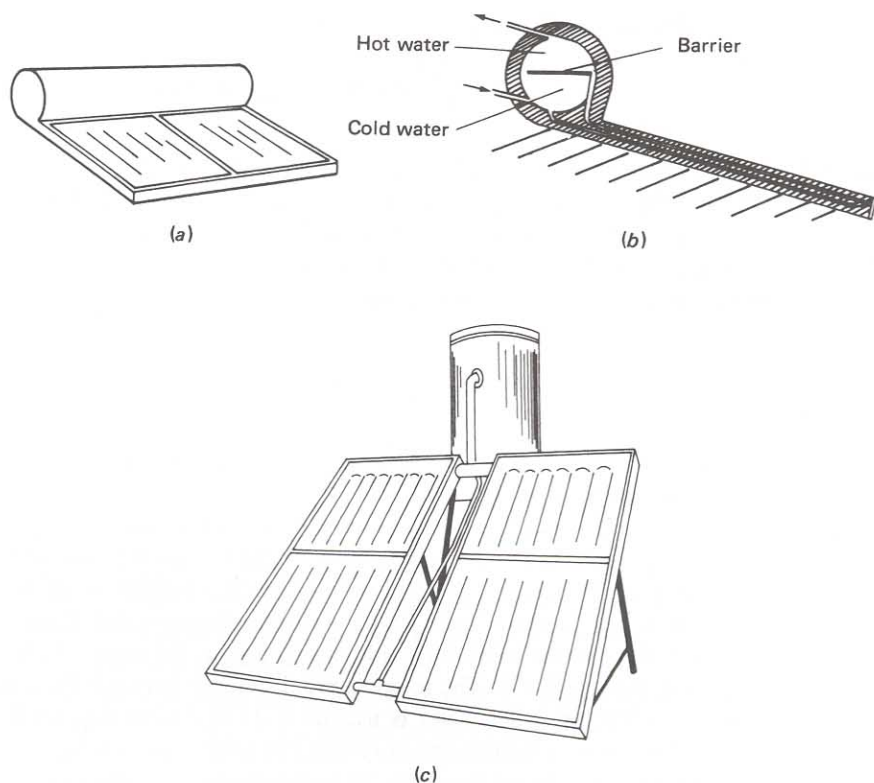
Passive solar water heaters; (a) compact model using combined collector and storage, (b) section view of the compact model, and (c) tank and collector assembly.
